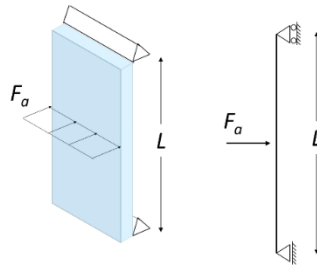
Out-of-plane tests on full-scale partition walls
